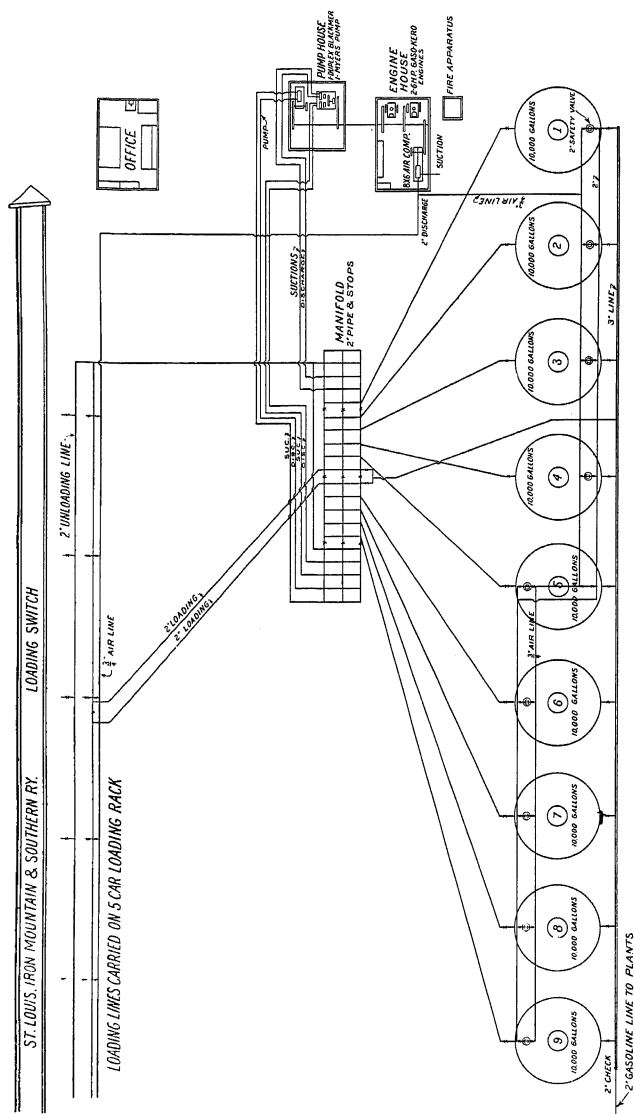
PLAN OF BLENDING STATION, MANIFOLD, AND LOADING RACK
